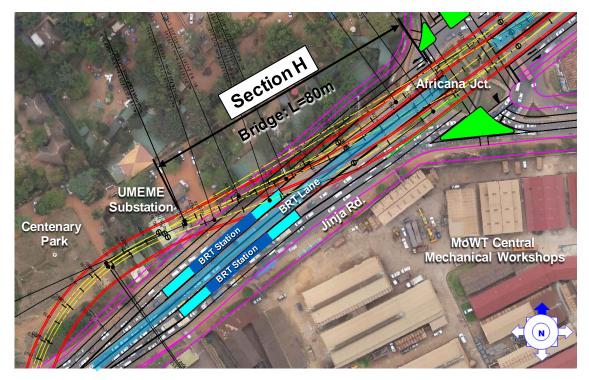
Section H: Transition curve section between Kitgum House Junction and Hotel Africana Junction Source: JICA Progress Report 2
